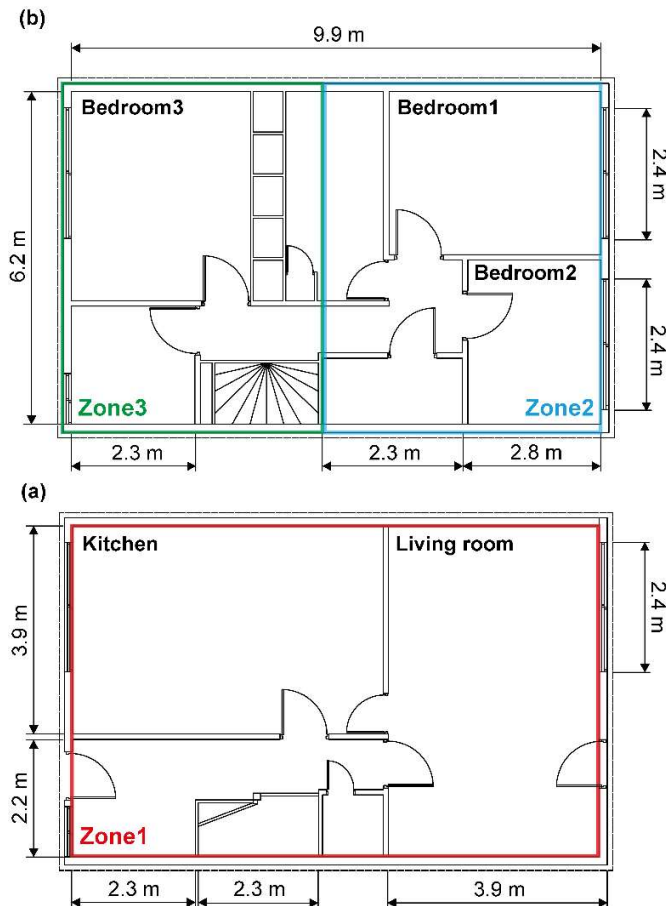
A layout for the two-story Emmen's dwelling: (a) first floor (Zone 1) highlighted in red, and (b) second floor (Zone 2&3) highlighted in blue and green, respectively
